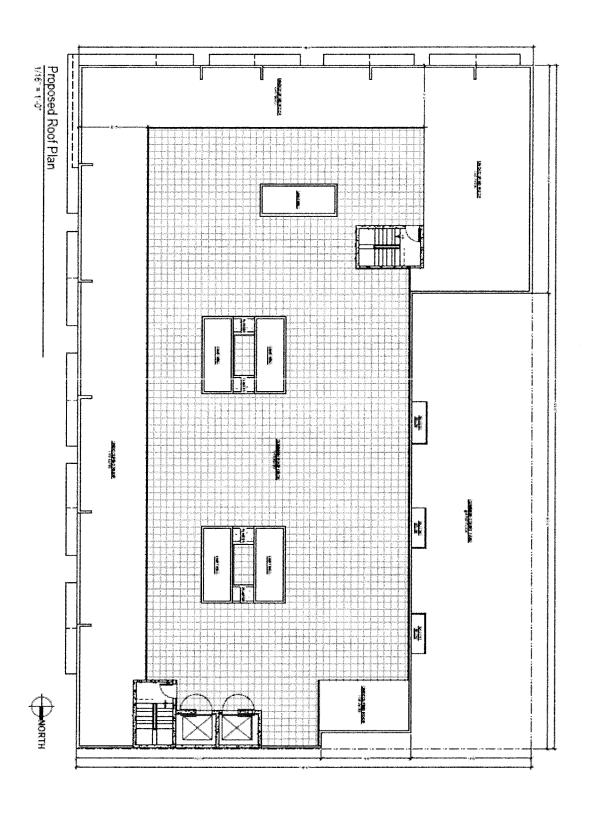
Roof Plan 480 Potrero Avenue Source: Sia Consulting, August 2012
